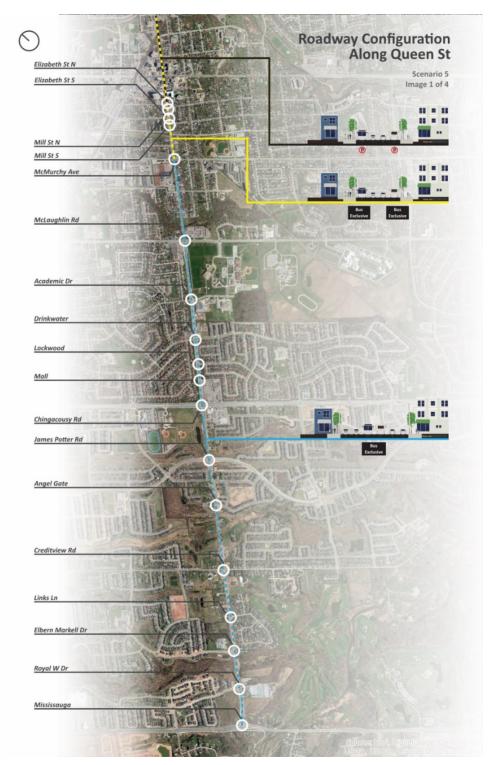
Scenario 5 road configuration, Mississauga Road to Mill Street North
